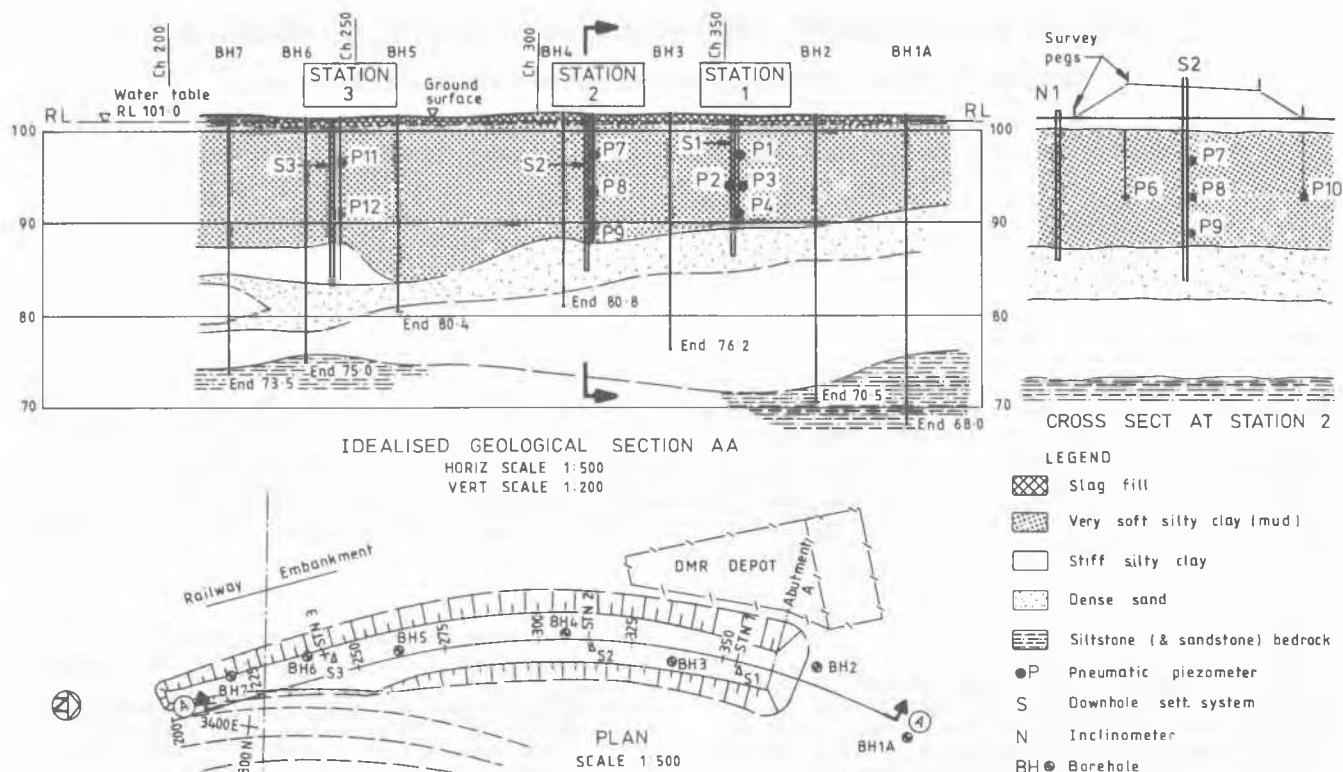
Longitudinal and Transverse Sections. Embankment Plan and Instrumentation.
